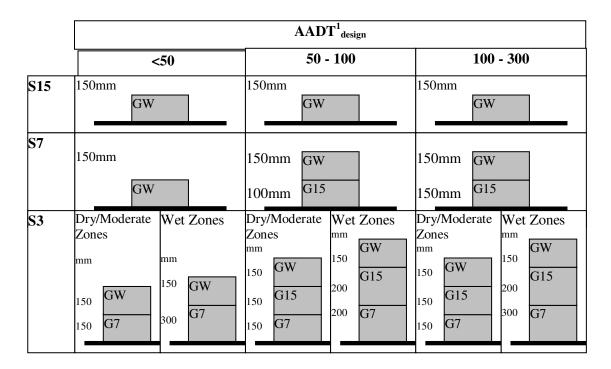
Pavement and Improved Subgrade for Gravel Roads for AADTs < 300
